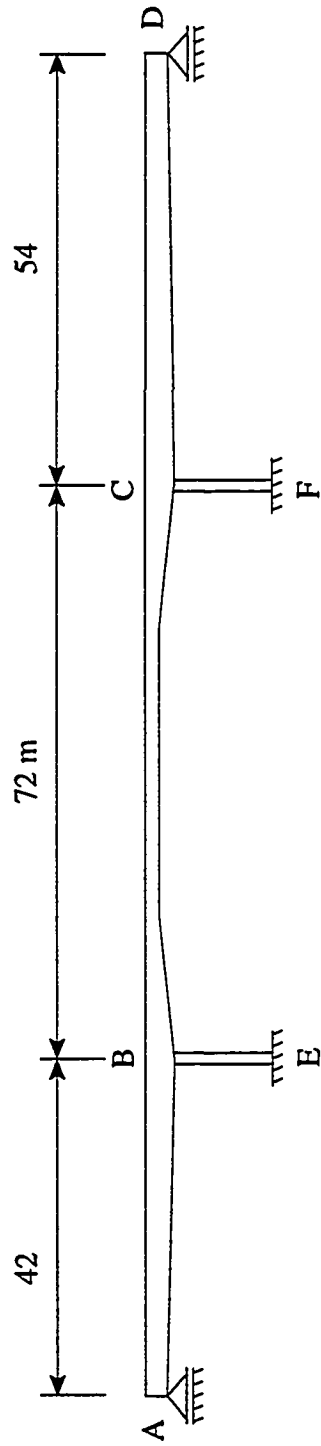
Developed Elevation of the Bridge used in the Demonstration Example
